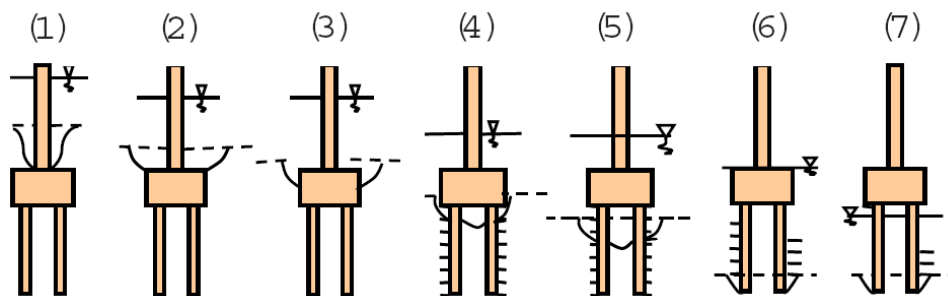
States of scour at complex piers due to elevations (Ataie-Ashtiani et al. 2010)
